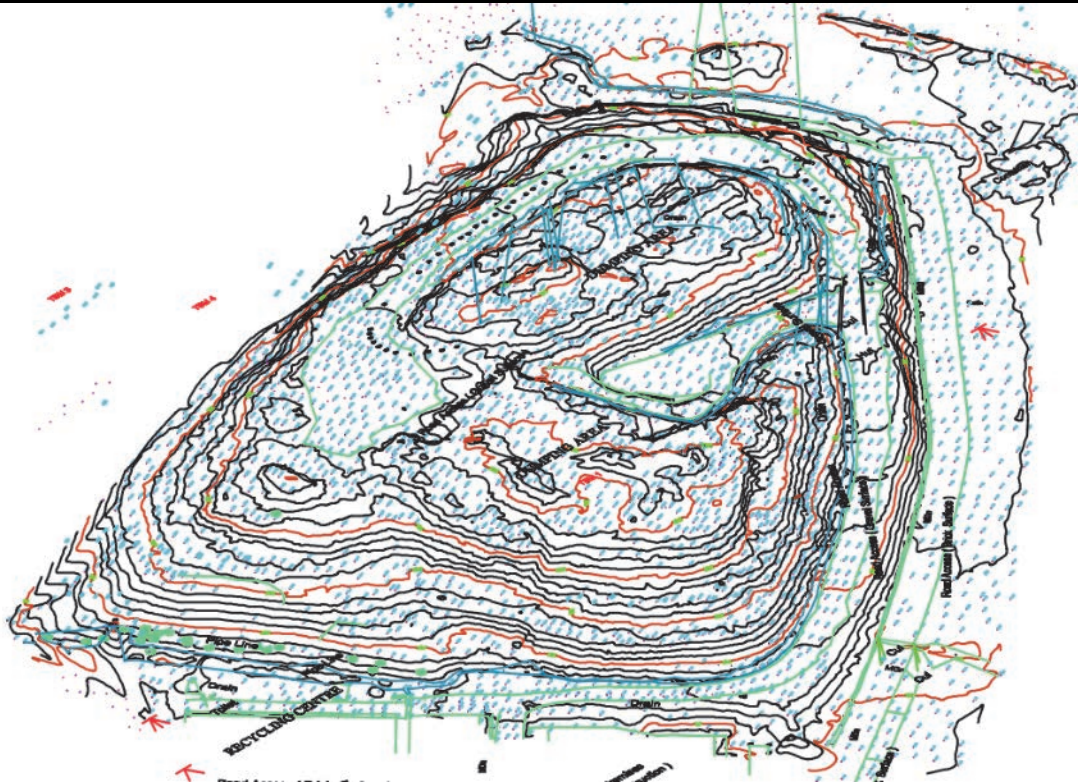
Isometric of organic waste accumulation area viewed from the southwest of the Site A
